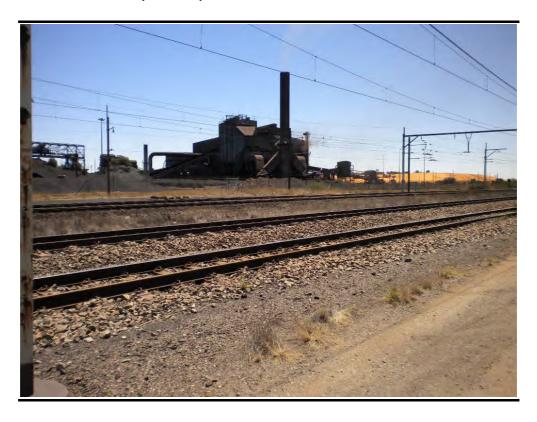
Mamathwane Compilation Yard: Facing North Along Railway Line at the Southern End of the Project Site
